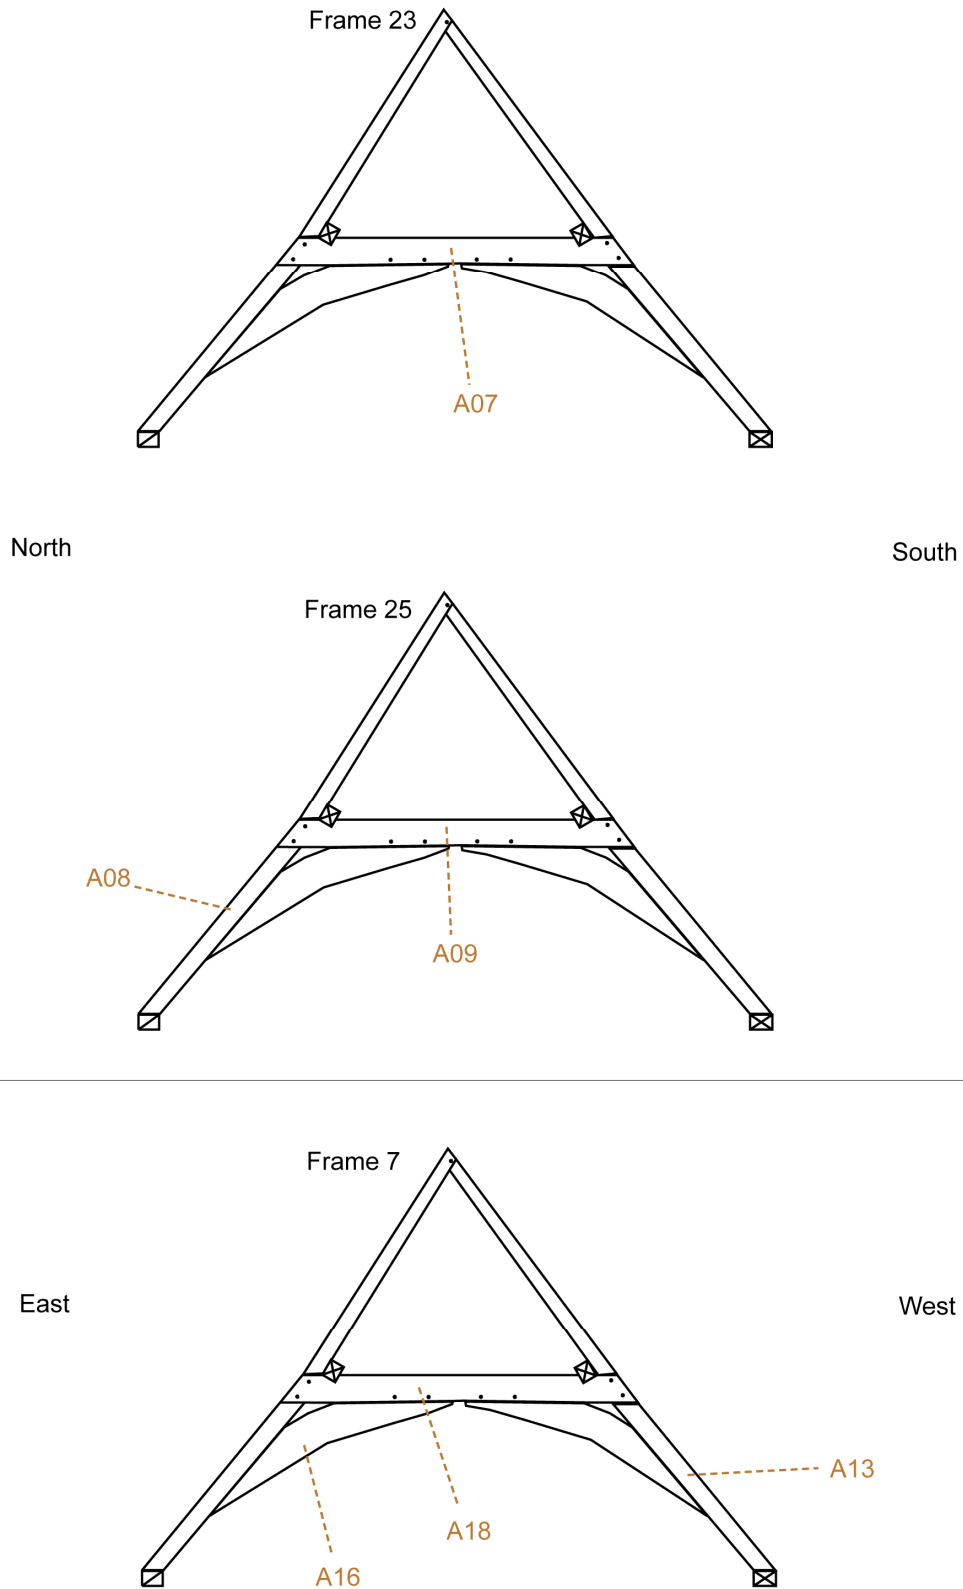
Great Chamber/cross-wing roof trusses, showing the locations of samples APT-A07–09 and Old Parlour/cross-wing roof trusses showing the locations of samples APT-A13, A16 and A18
